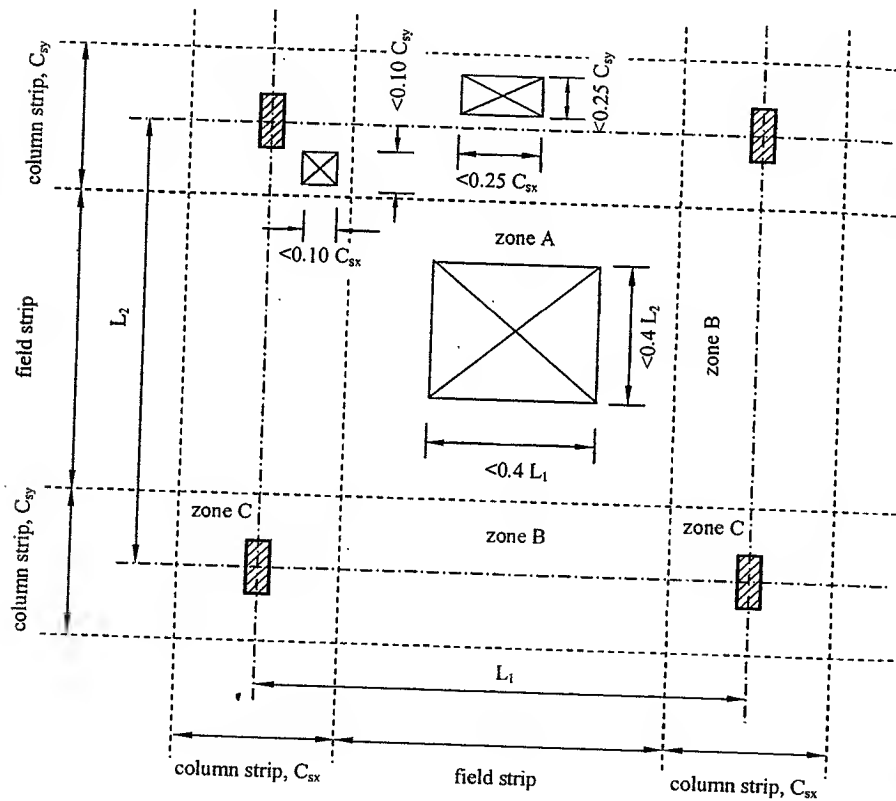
Allowed opening dimensions and locations in flat slab systems
